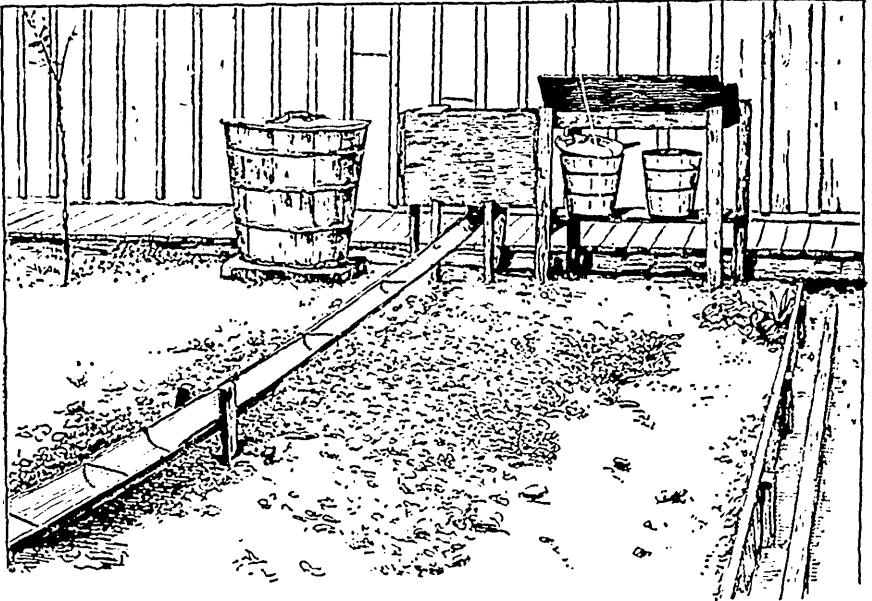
Drain Made from a Tin Roof-Gutter.
